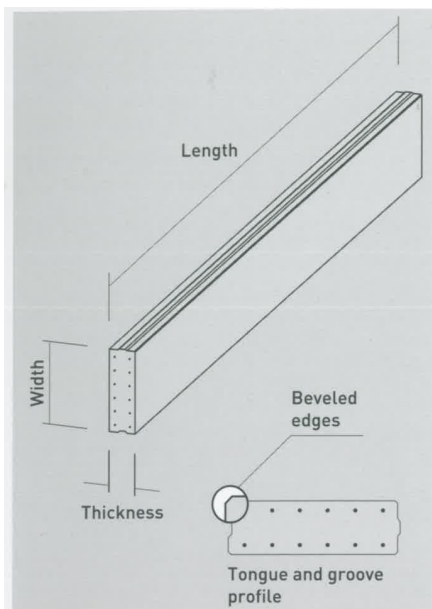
Hebel® Wall Panel (AAC steel reinforced element).
